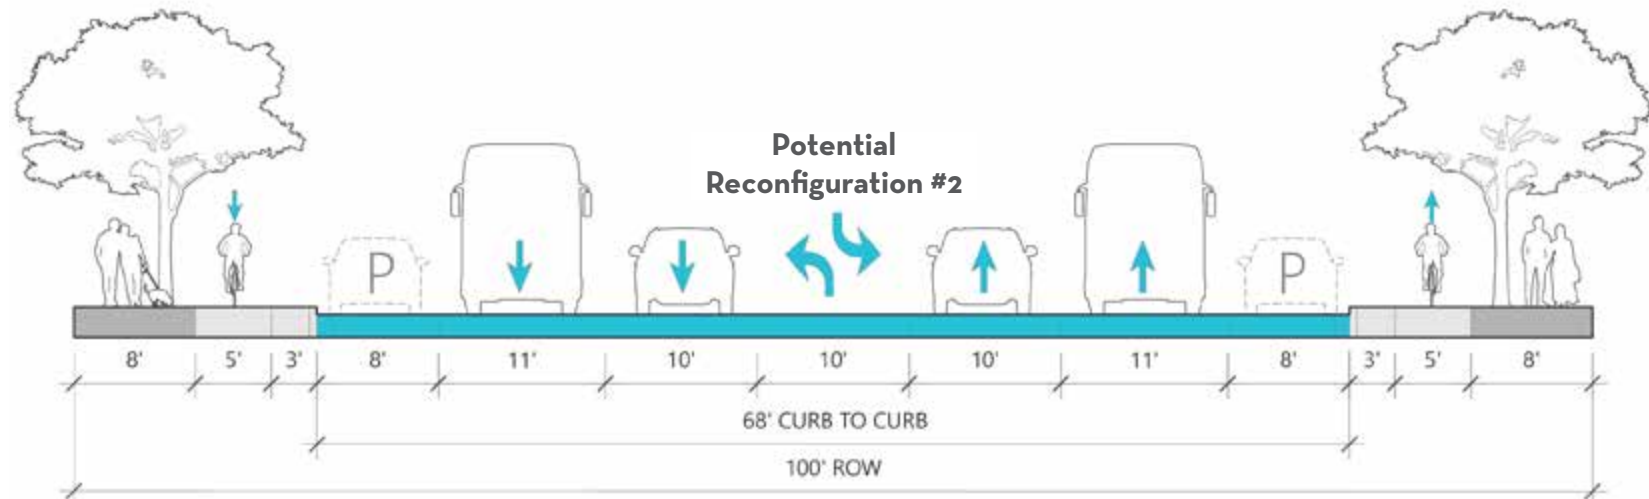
Potential Reconfiguration #2: One-Way, Sidewalk-Level Class IV Bikeway on an Arterial Street.
